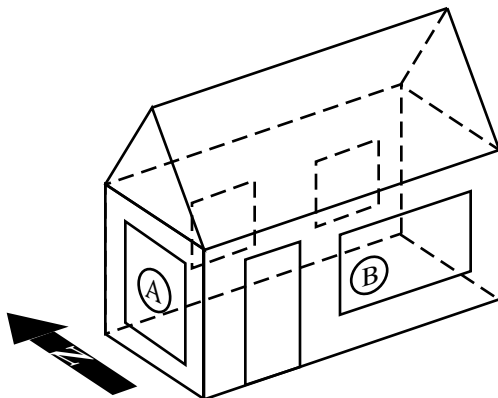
Shear walls resist base shear, supporting a building during horizontal shaking.
